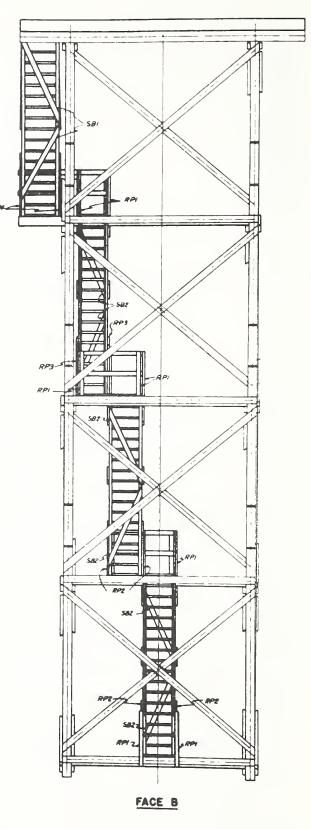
This plan shows the stair layout for the standard timber lookout tower, CT-2 series. It was drawn in 1938 and is 53 feet tall. The plans call for 8 by 8 inch timber for the main posts and 3 by 6 inch timber for diagonals.
